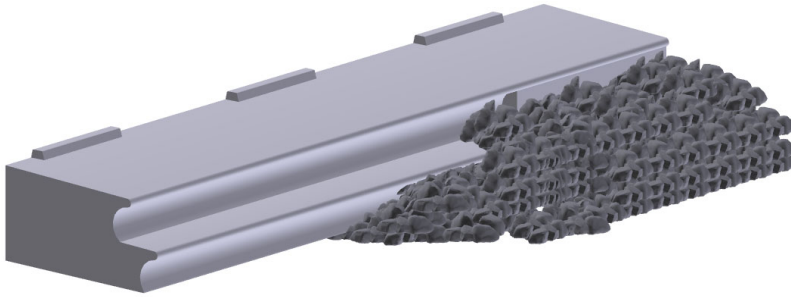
Typical design of transition between double curve and revetment seawall types. [Source: Design Features Report (Stantec 2018b)].
